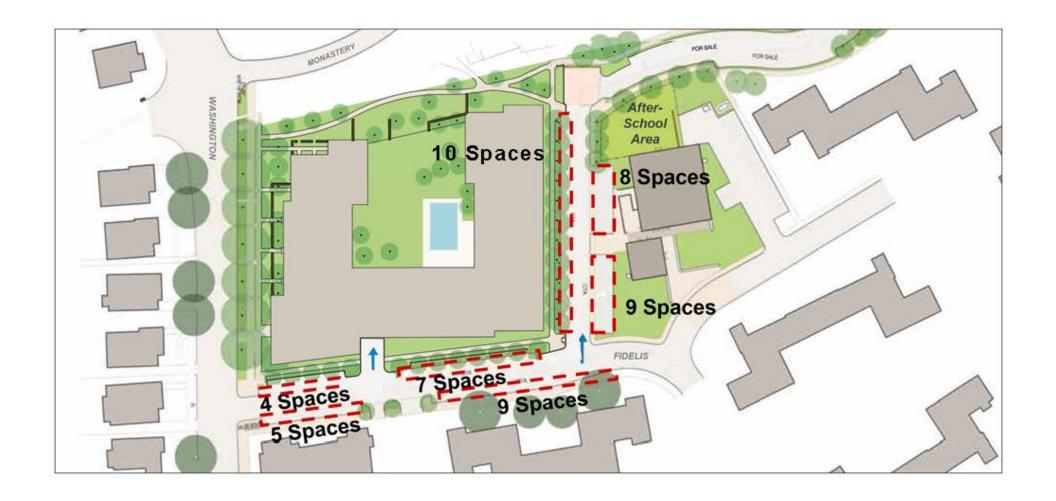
shows the upgraded parking area that will serve the community center. As shown in the figure, the parking spaces will be better defined and two full lanes of travel will be created. The parking layout will be designed to the appropriate standard. The layout will be better delineated and will improve safety conditions in the area. A new crosswalk and new sidewalks will also be installed to create better pedestrian connectivity through the area. This connection will also serve as the primary access route for all vehicular traffic related to the home-ownership building in the rear of the site.
